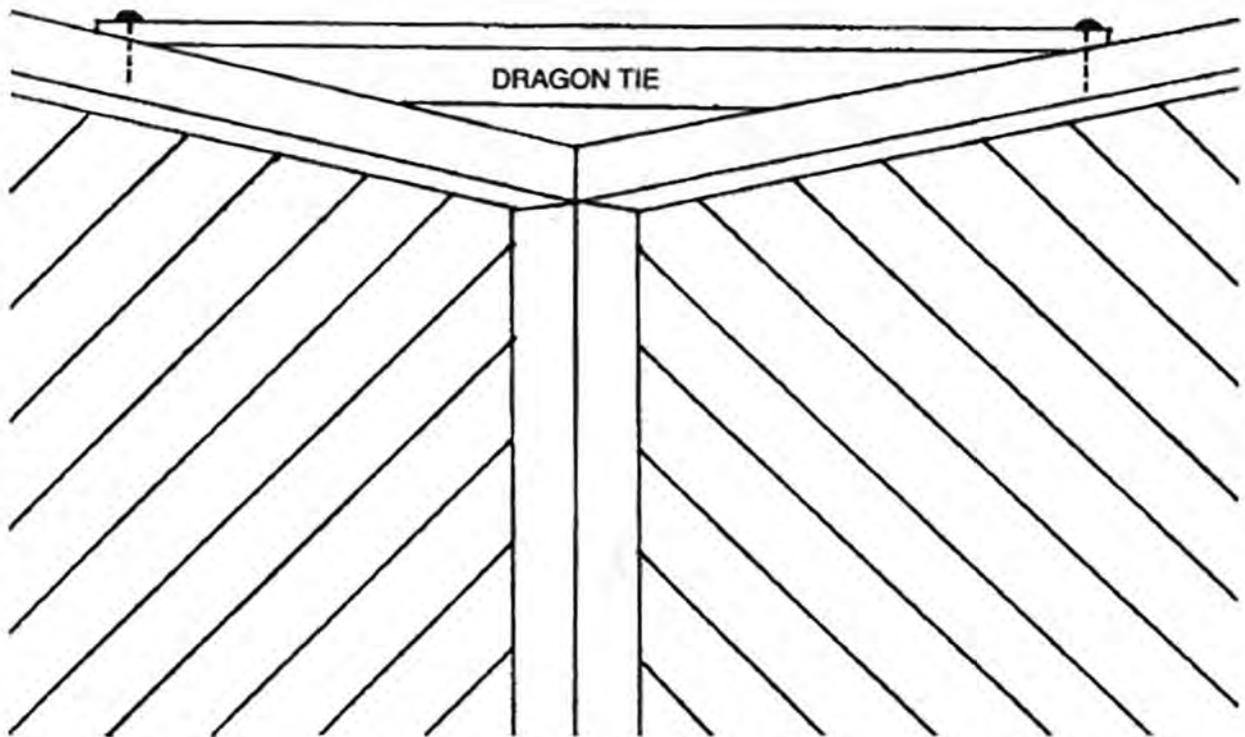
USE A DRAGON TIE TO BRACE EXTERNAL WALLS
